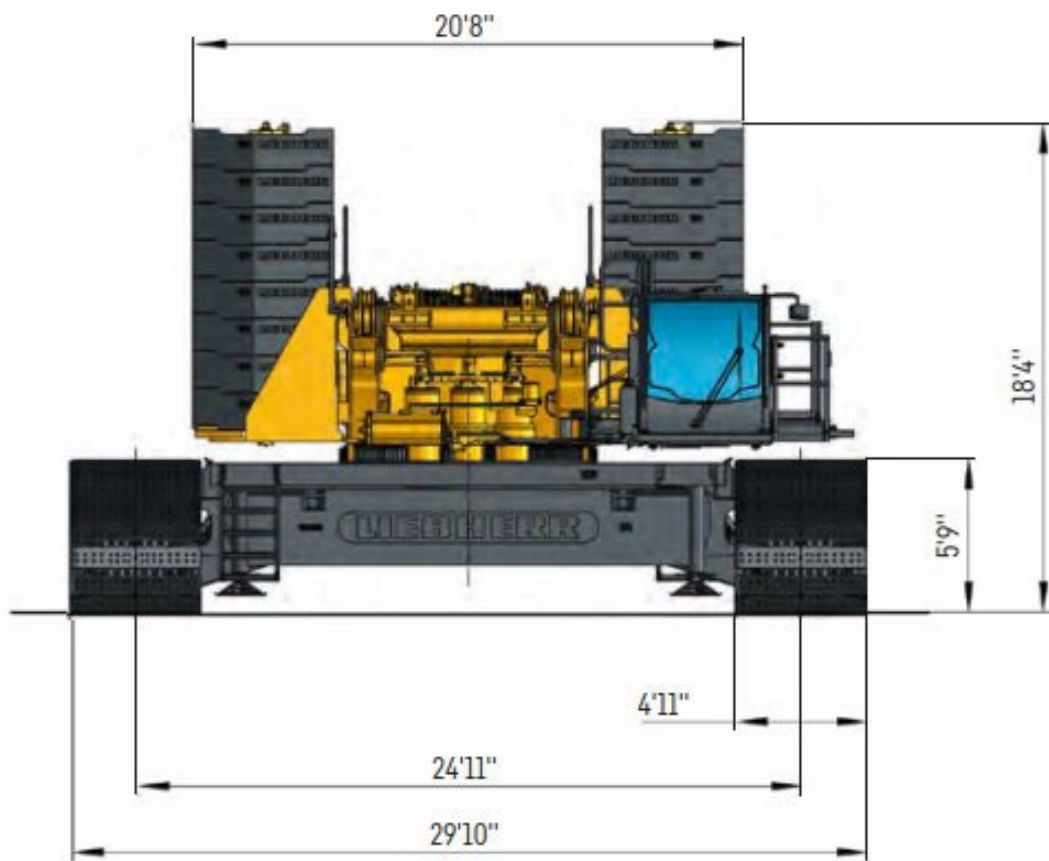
Schematic of Type of Large Crawler Crane Equipment to Be Used
